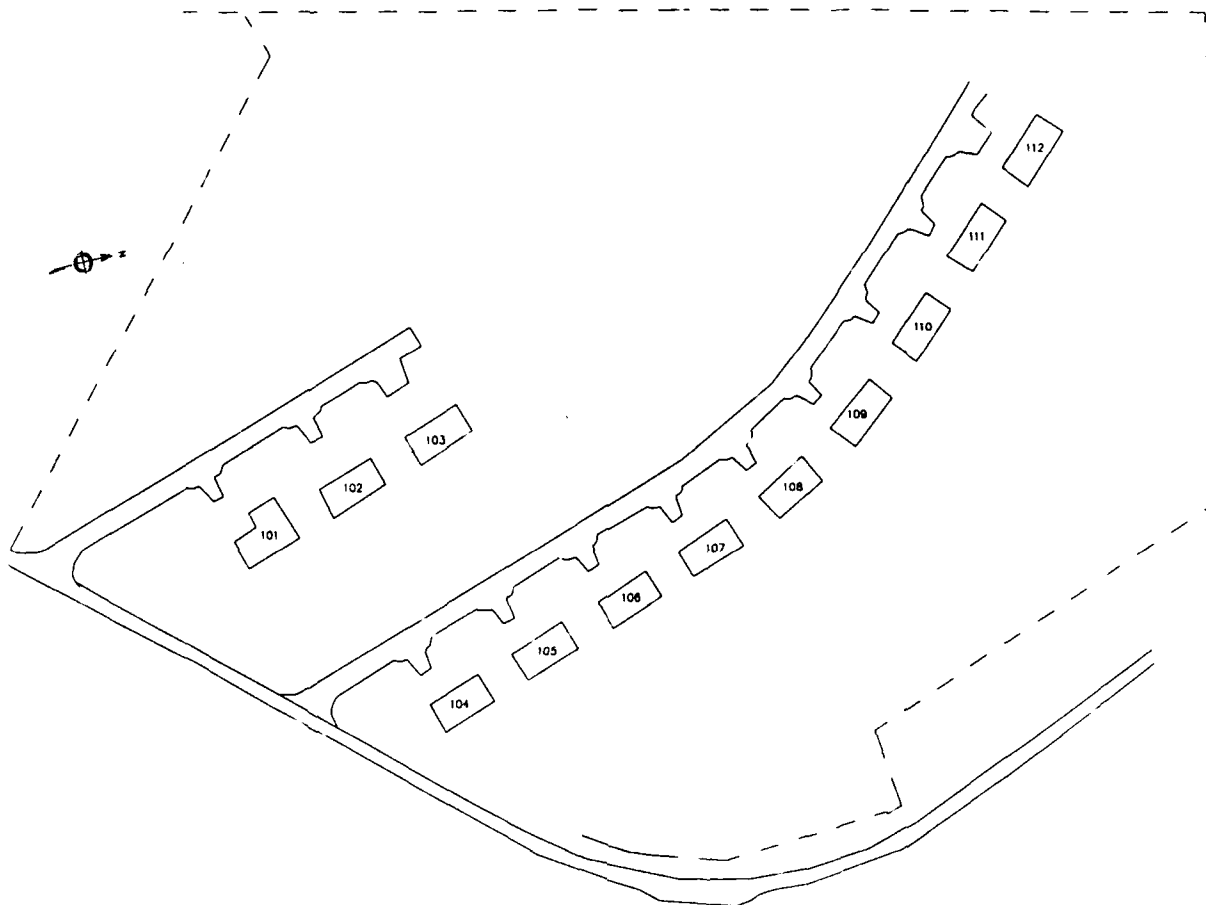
Site Plan Map of Finleyville Army Housing Units
